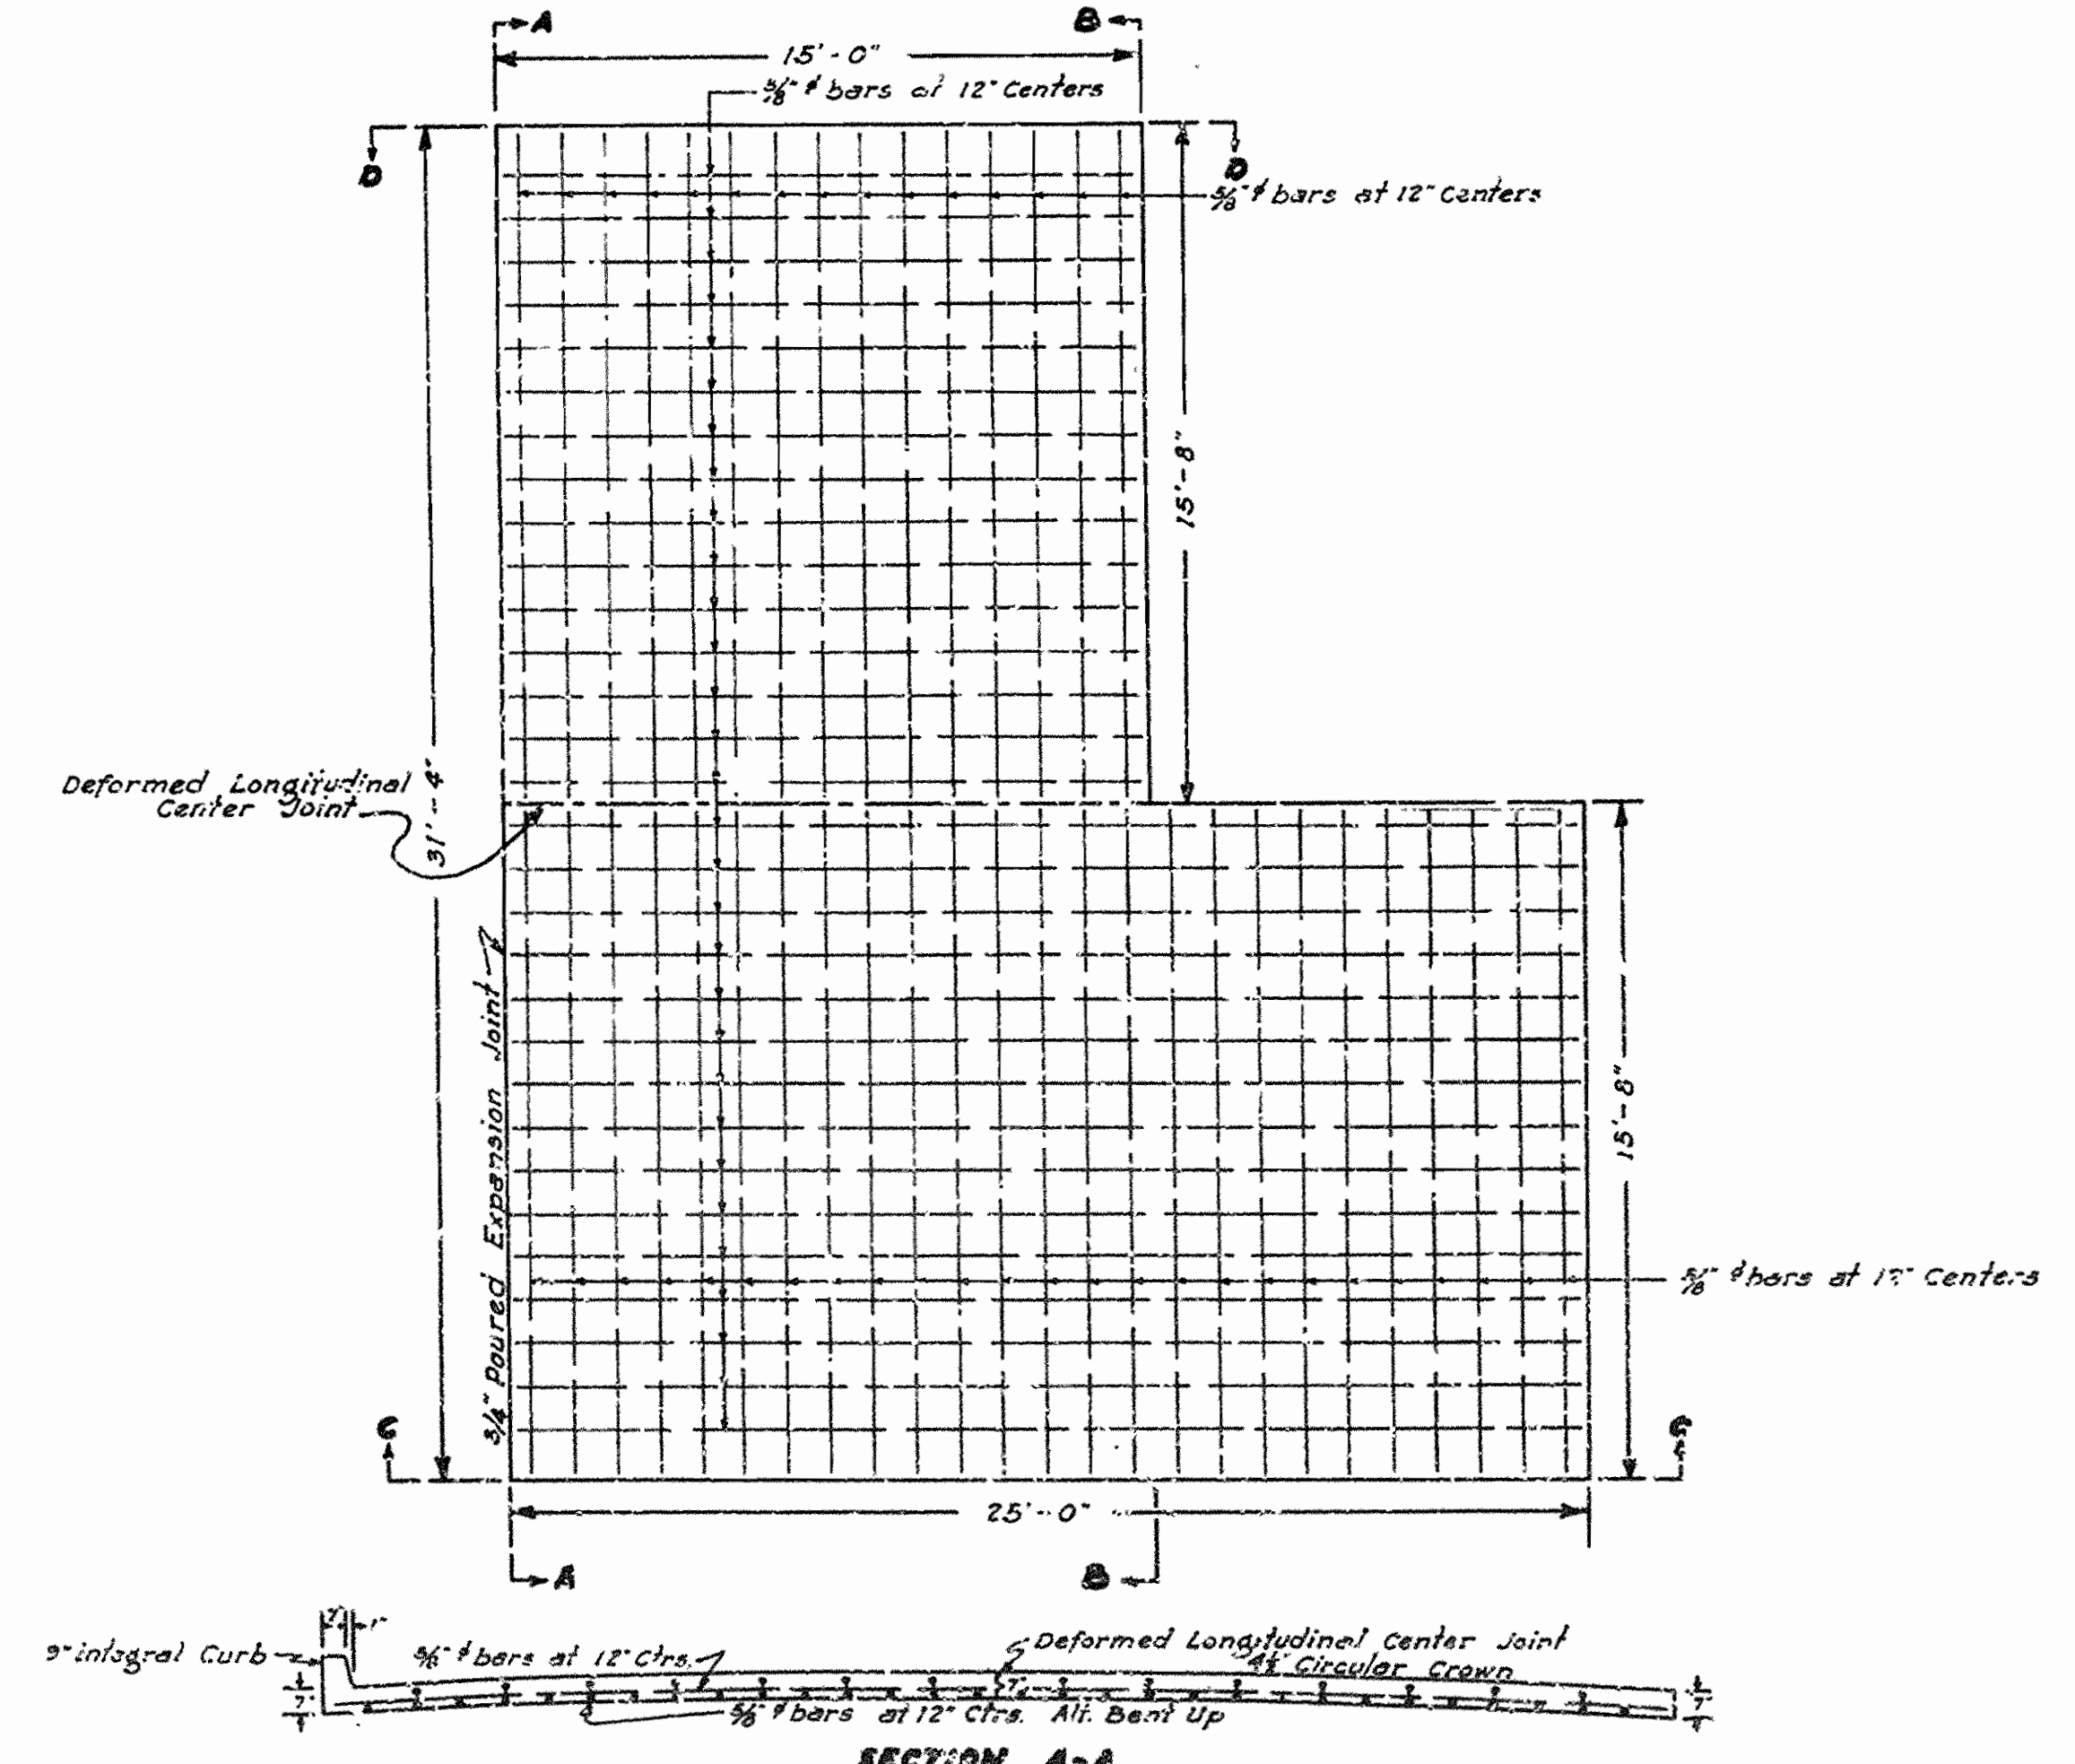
DETAILS OF TRANSITION AT BEGINNING OF JOB STA 5+00 TO STA 5+50
